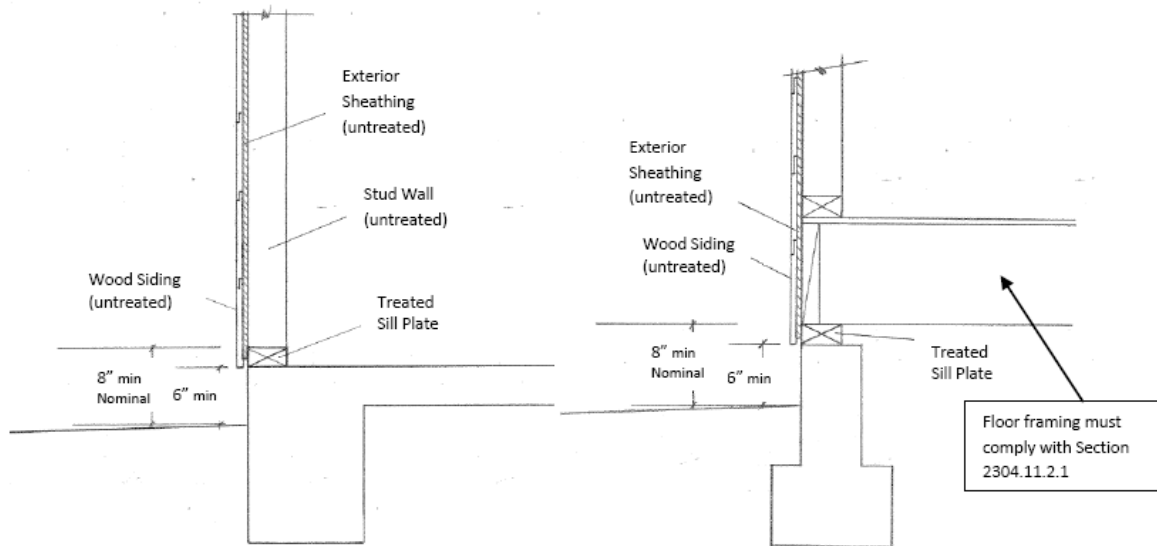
Wood Siding over Exterior Sheathing slab-on-grade (section 2304.11.2.2)
